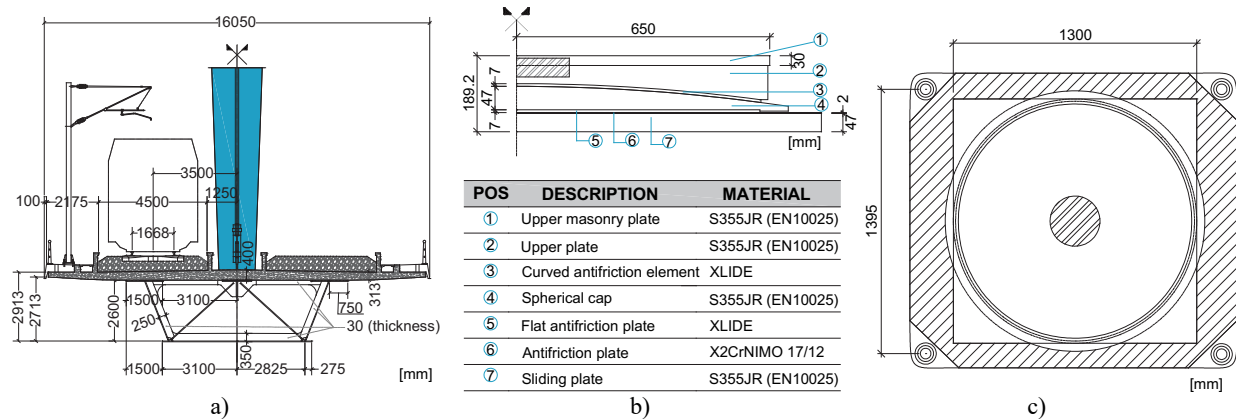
Design drawings: a) Cross-section of the deck, b) half of the bearing lateral view on piers P2/P3, c) floor plan of the bearing on piers P2/P3 (adapted from GRID et al. [34]).
